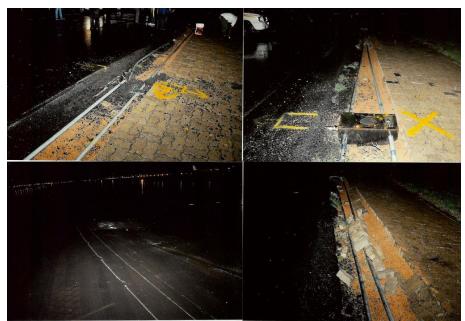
Damage to underconstruction pavements and wire conduits
